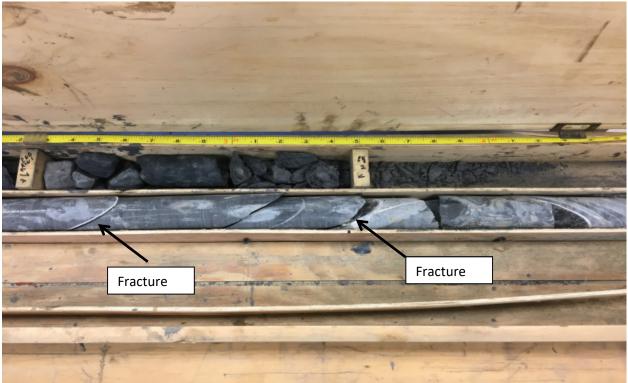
Boring B-4: Core Run 1 (63.5' – 66.0') and Core Run 2 (66.0' – 67.8'). Note: B-4 core recoveries low. Boring B-3: Core Run 1 (93.5' – 98.5')
